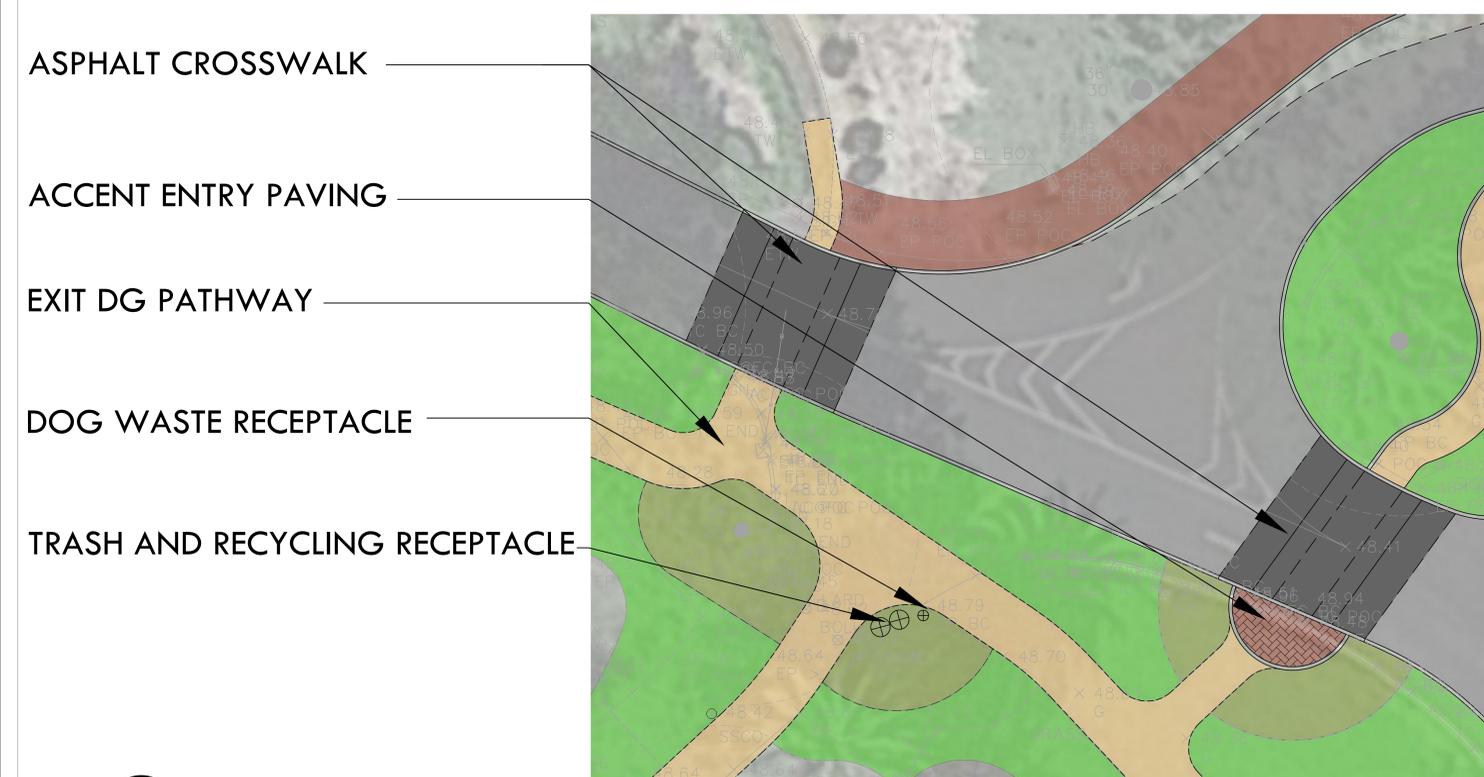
EXHIBIT B - SCHEMATIC PLANTING PLAN
